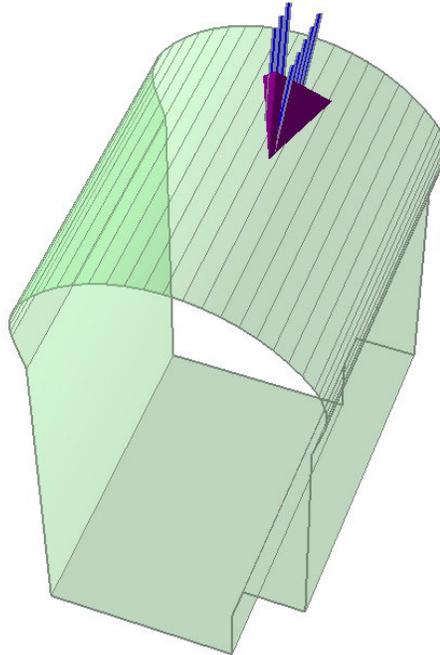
Perspective view of roof wedge in the Rio Grande cavern roof. The size of this wedge has been defined by setting the trace length of the 50/345 joint to 6 m. Eight 10 m long 50 tonne capacity grouted anchors give a factor of safety of 1.6 .
